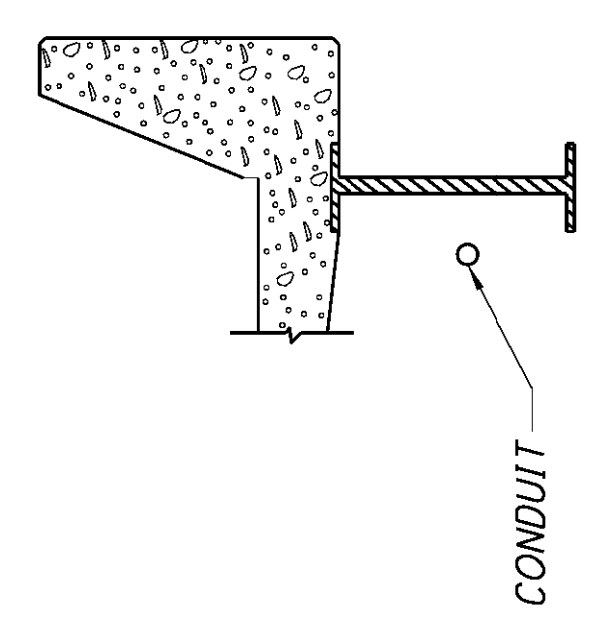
DETAILS OF CONDUIT TRANSITION BETWEEN RETAINING WALL AND RIGHT PARAPET OF WAR-122-0094 STRUCTURE
